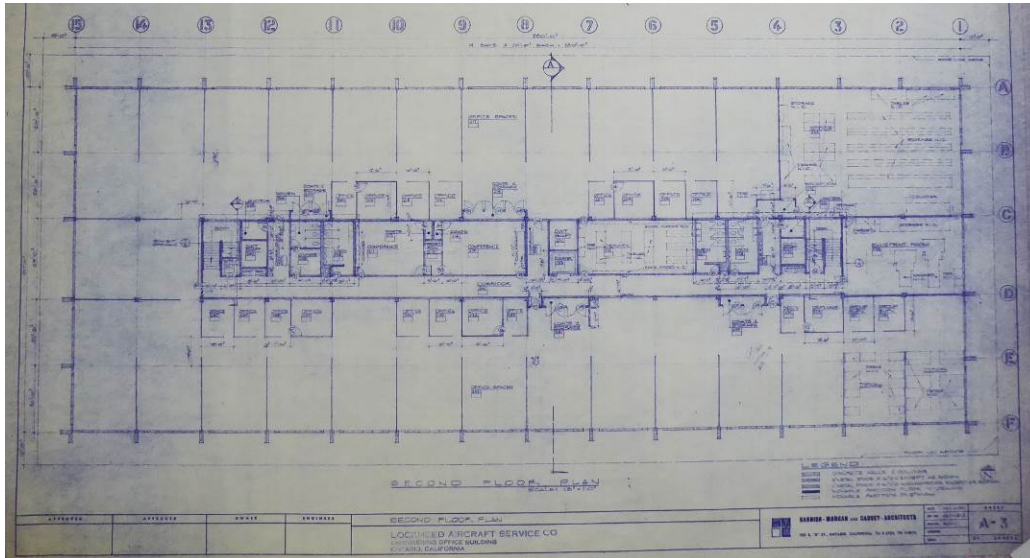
Second floor plan. Architect's drawing, 1967. Source: LAWA records.
